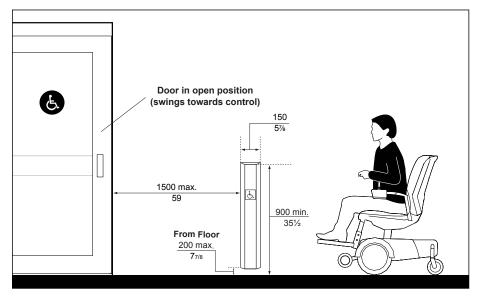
Vertical Extended Power Door Operator Control - Elevation View
